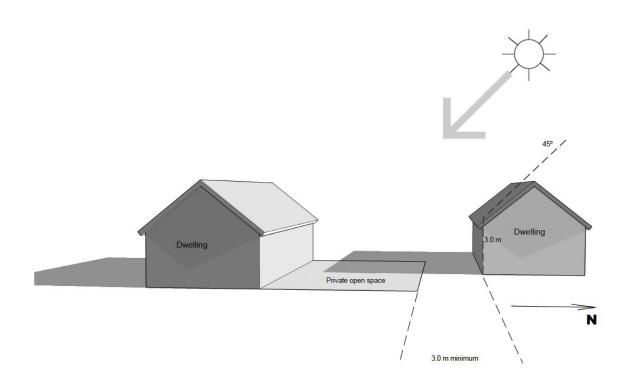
Separation from the private open space of another dwelling on the same site as required by clause 9.4.4 A1(a)
